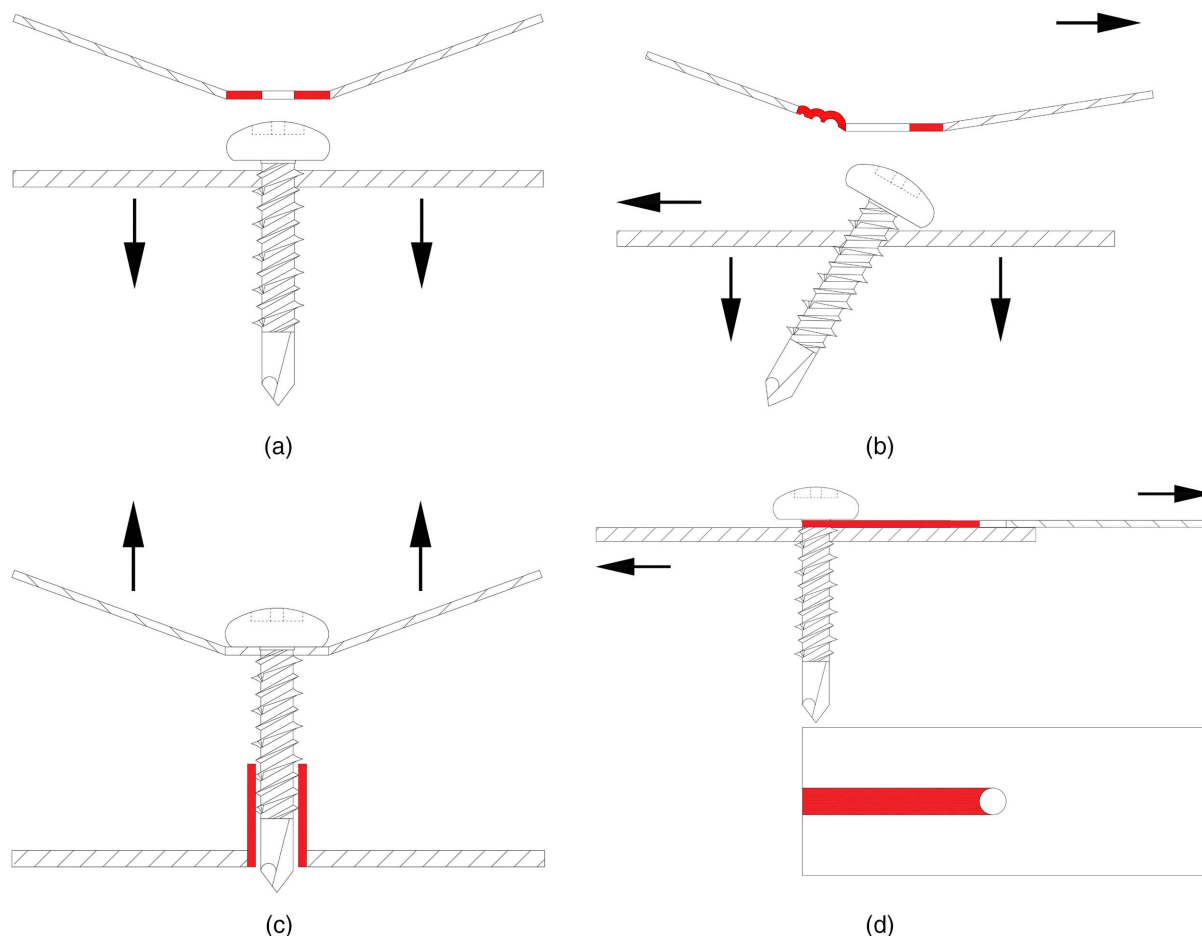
Screw-fastened connection failure mechanism: (a) pull-through; (b) pull-through with tilting and bearing; (c) pull-out; and (d) shear rupture.
